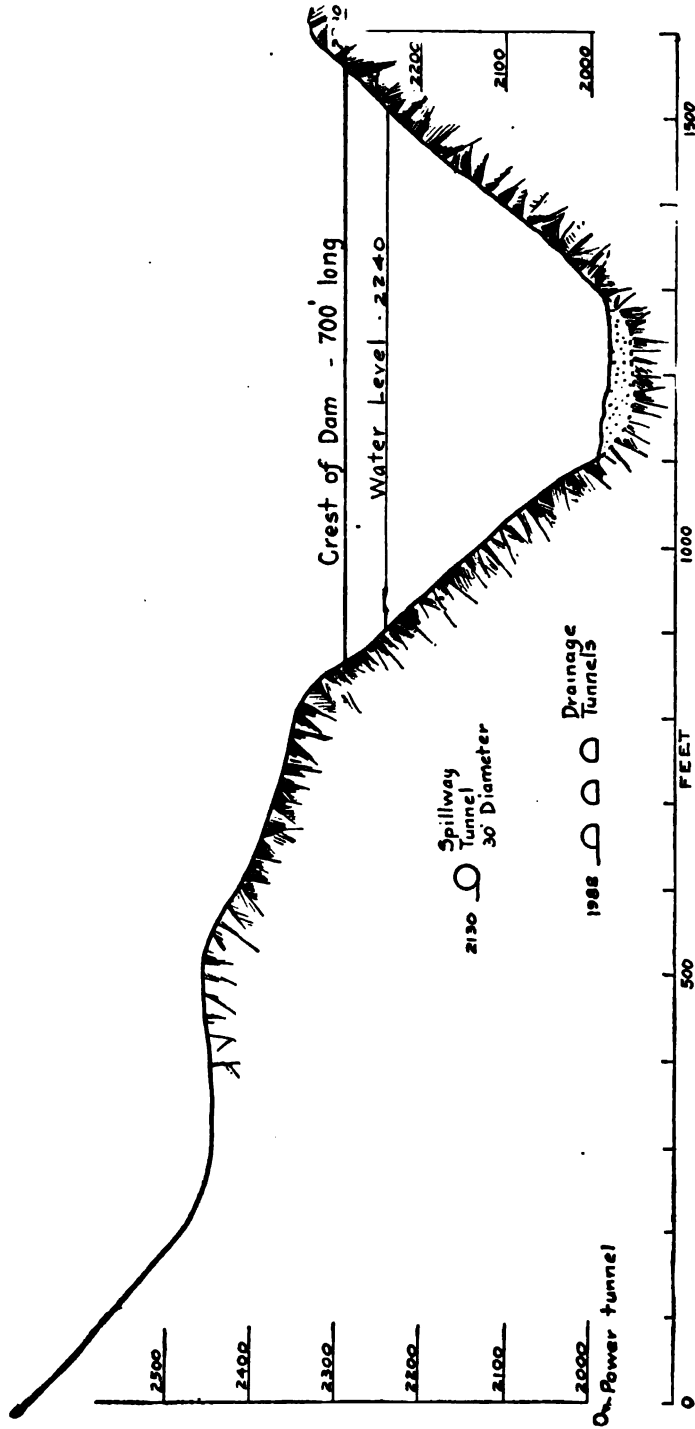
LONGITUDINAL SECTION OF THE IKAWA DAM, JAPAN, LOOKING DOWN STREAM
